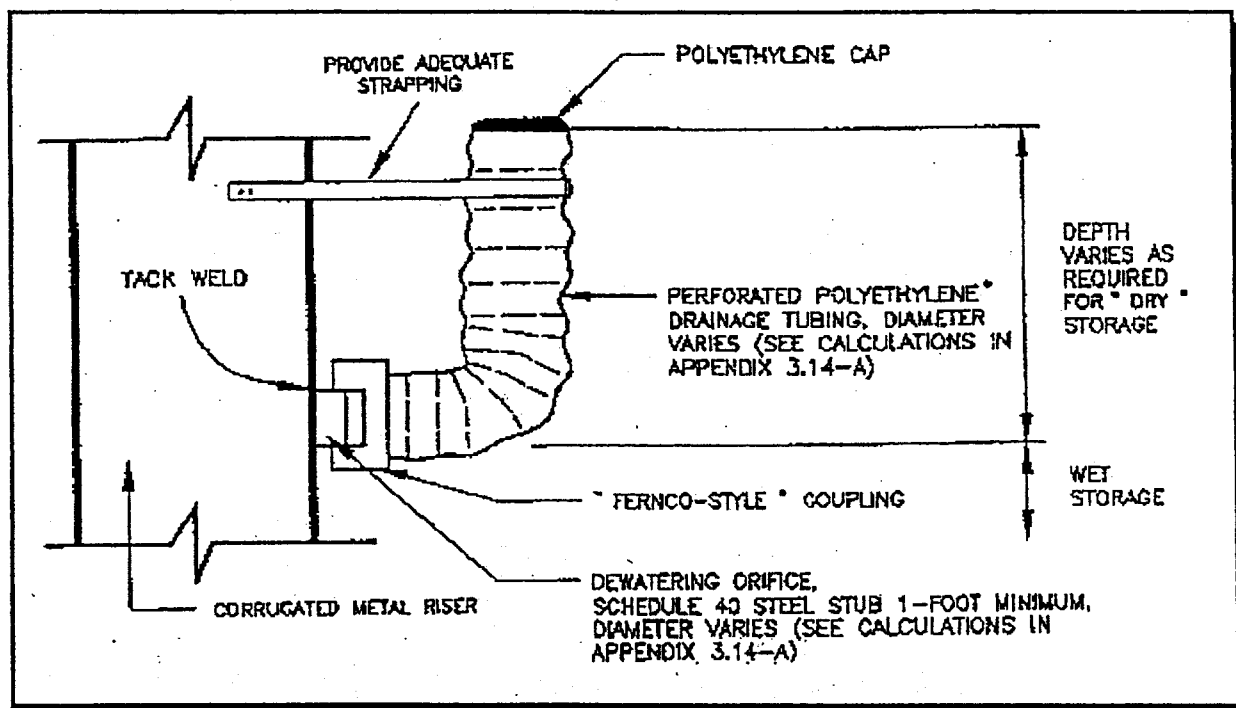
Perforated Pipe Sediment Basin Dewatering Device
